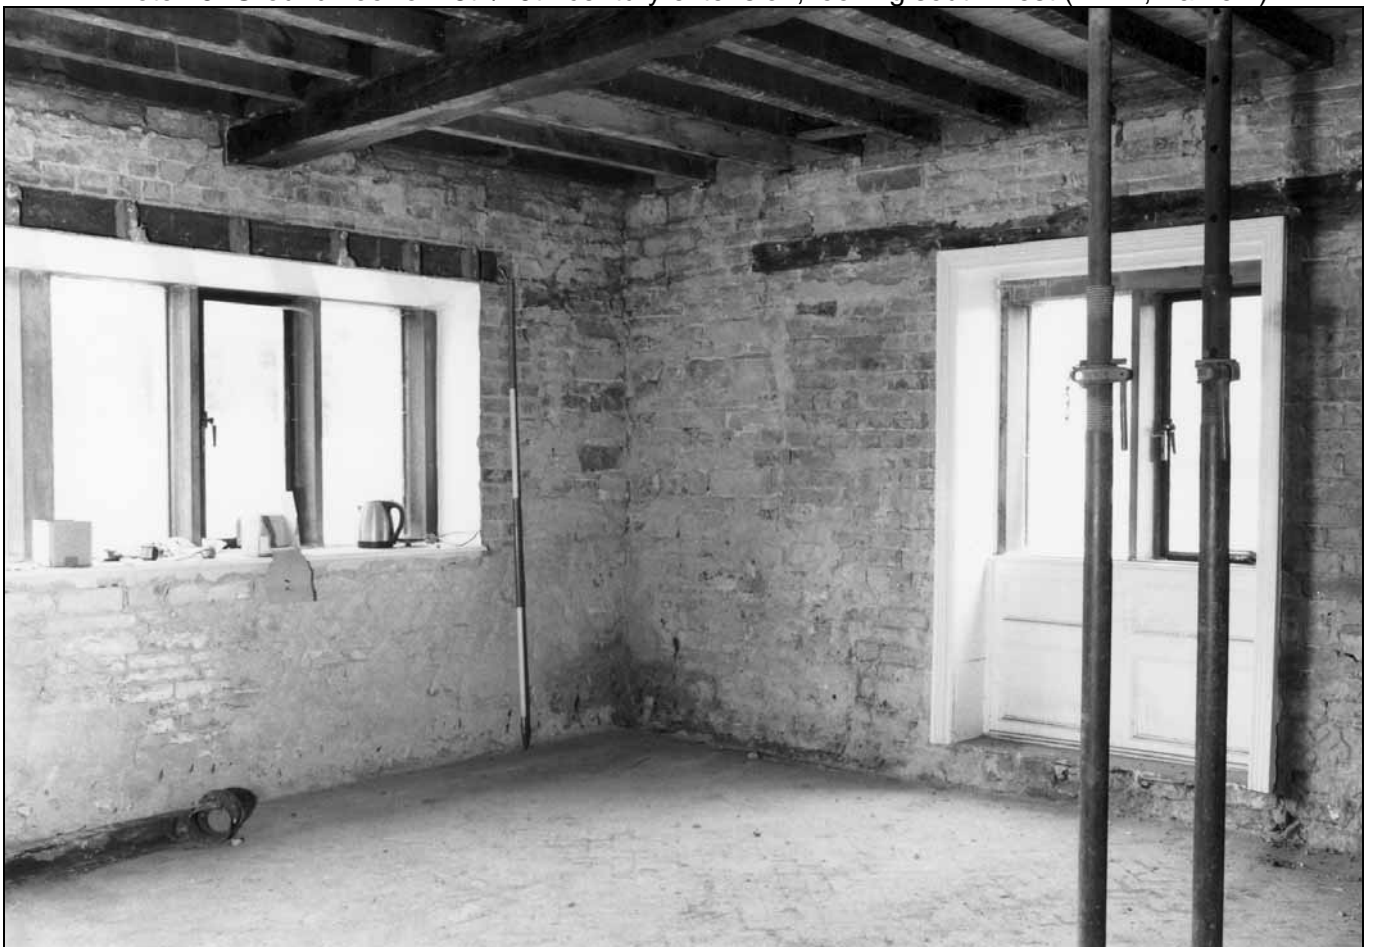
Ground floor of 18th/19th century extension, looking north-east (film 2, frame 2)
